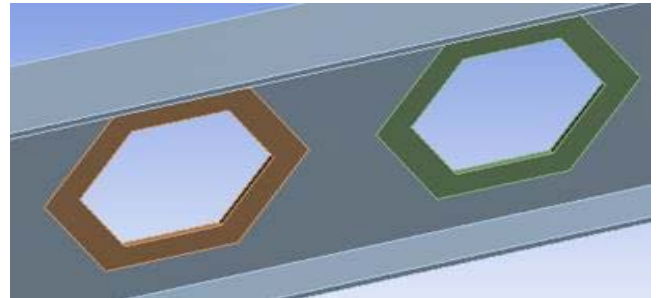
Zoomed view of model of homogenous castellated beam with stiffeners
